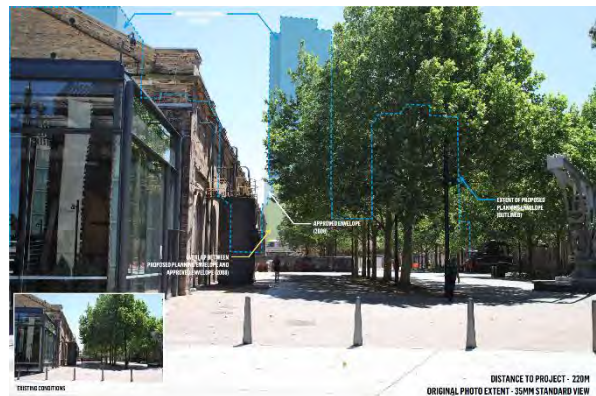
Proposed view of building envelope north from Innovation Plaza. yellow shading indicates the overlap between proposed planning envelope and approved 2008 envelope) (Source: Urbis 2022: VP 8)
